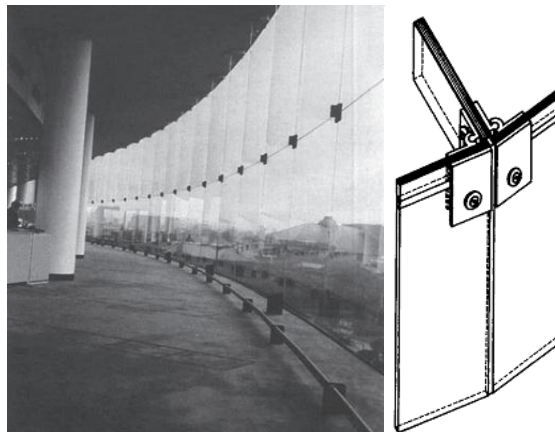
The Details Shows Isometric View of the Building Perimeter, Glass Connection Type and the Facade Connection in Detail (Michael, W. 1996)
